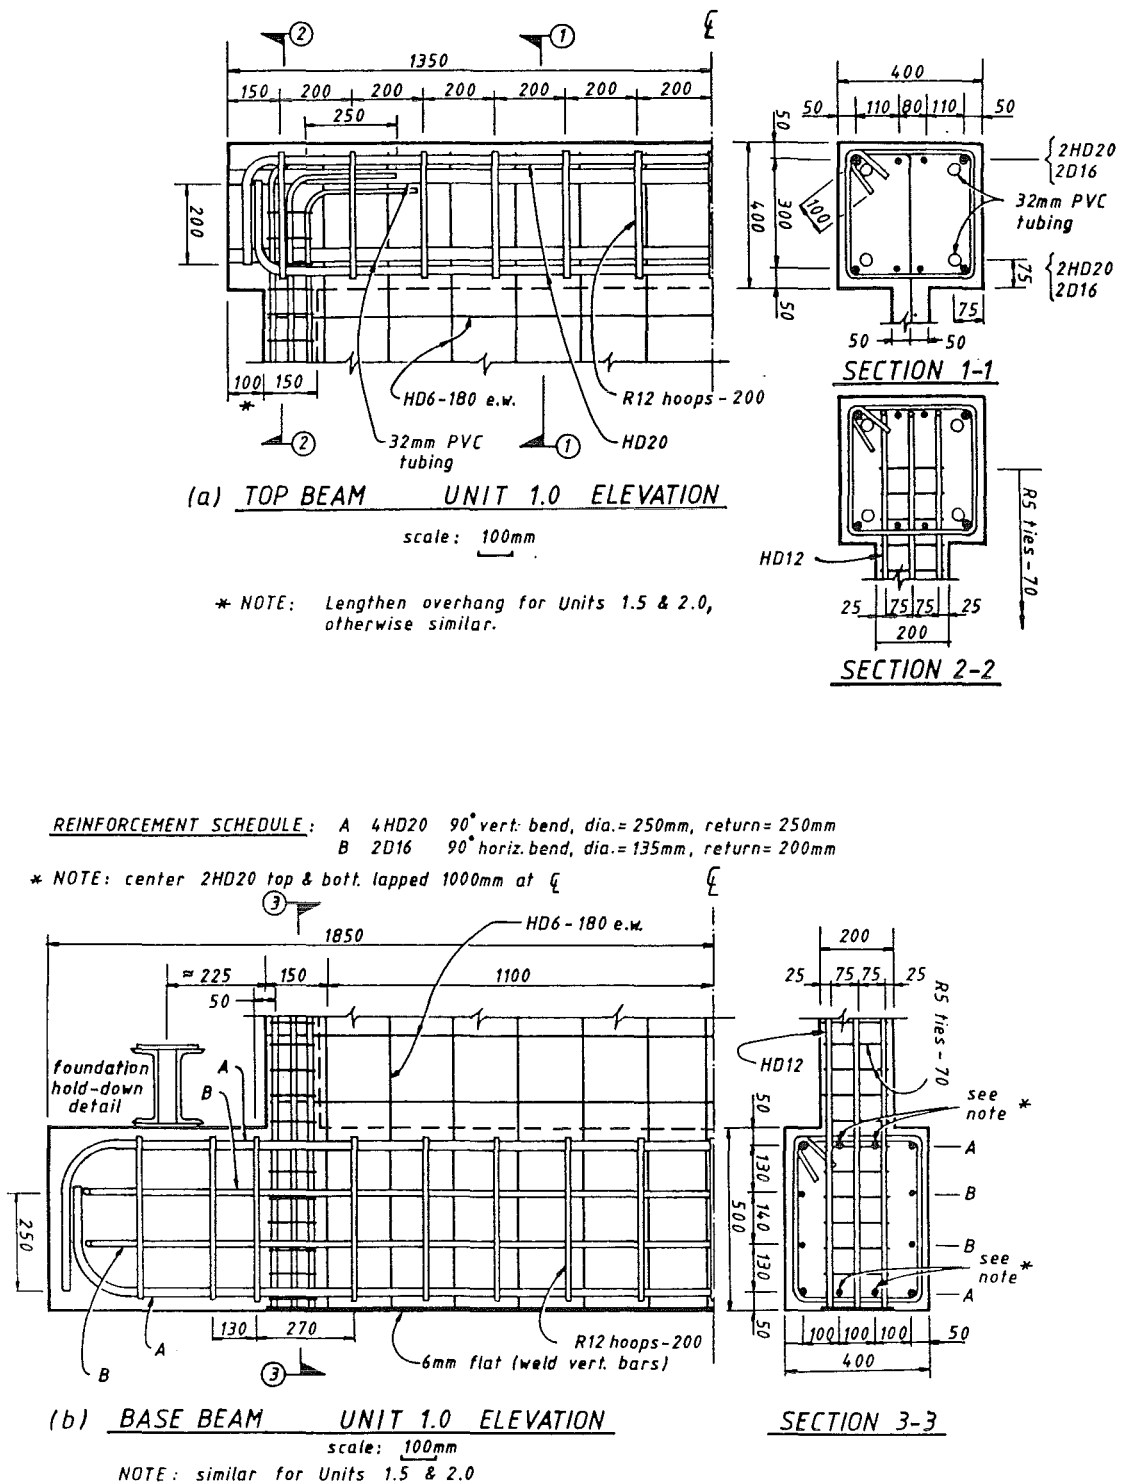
UNIT 1.0 - Reinforcement details for the top and base beams (Note: Details for Units 1.5 and 2.0 are similar.)
